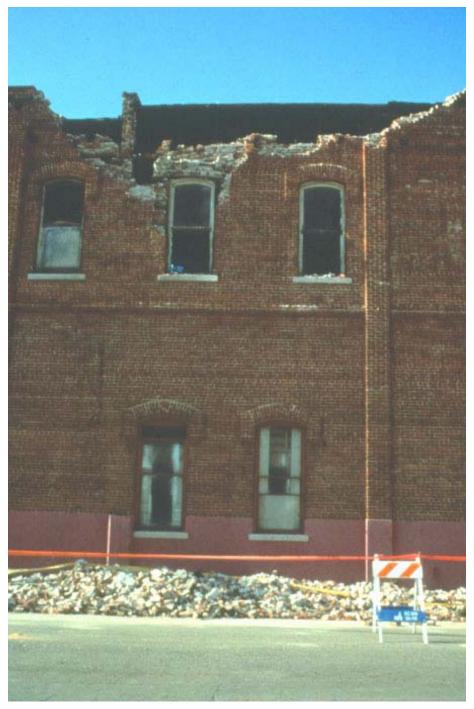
Photo showing fallen parapets from an earthquake-damaged unreinforced masonry building. (ATC-20 Training Slide Set photo)
